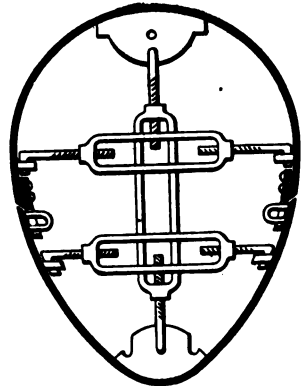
Blow Collapsible Steel Centering for Sewers.
